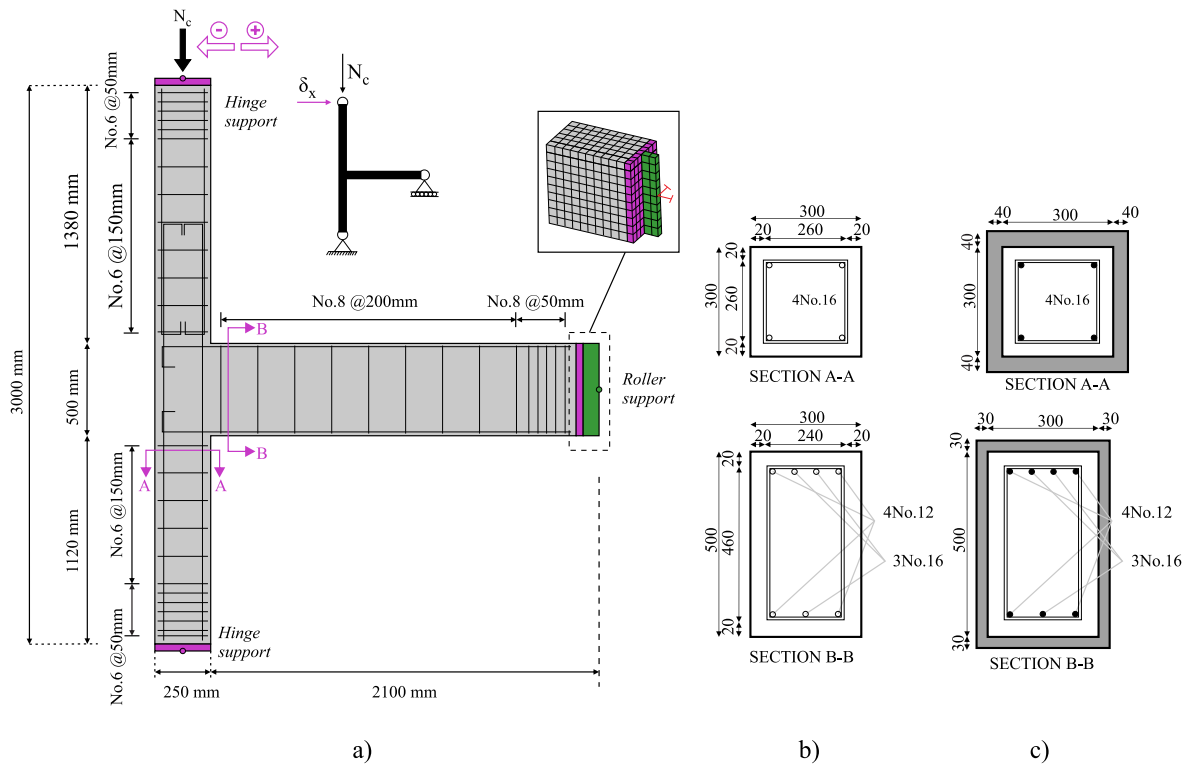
Geometrical details of: (a) beam–column joint, (b) sections of sub-assembly CJ2, and (c) sections of sub-assembly RCJ2 [26].
